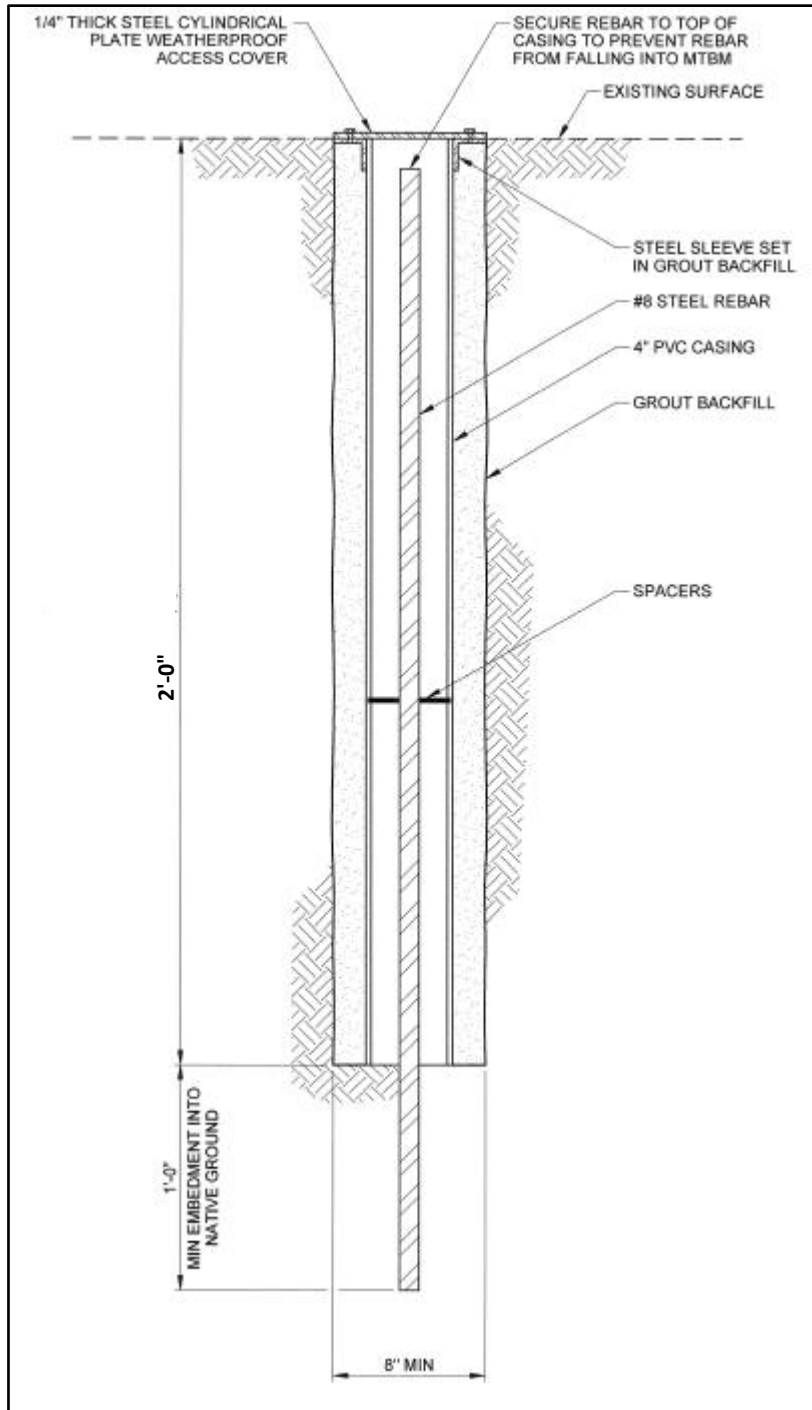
Example detail for Surface Settlement Monitoring Point (SSMP)
